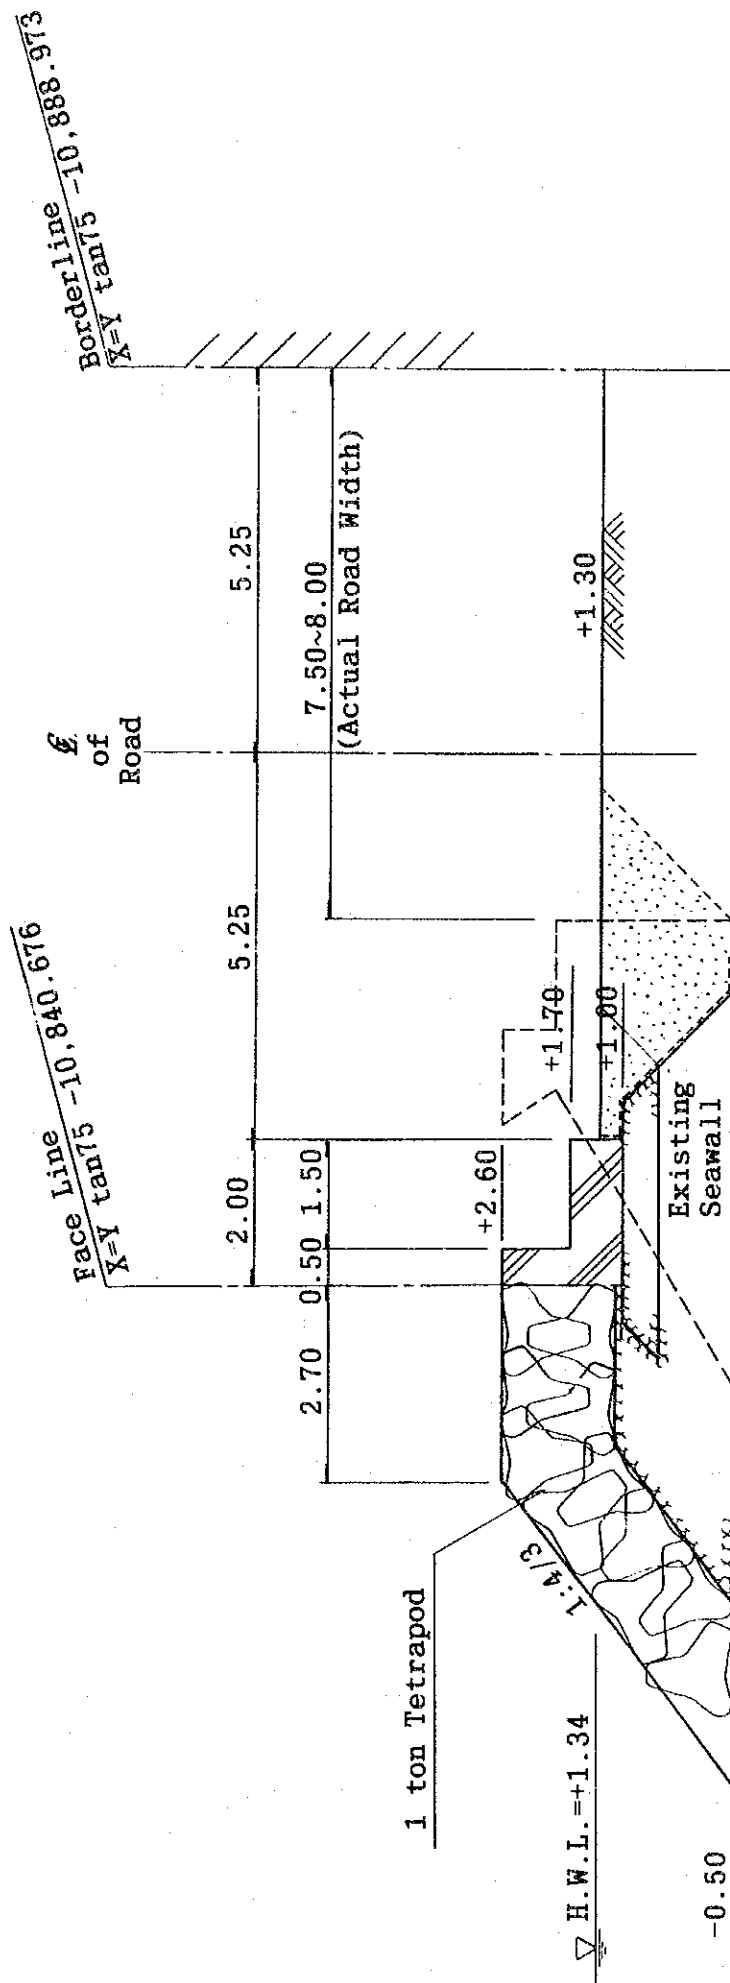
Typical Section of West Coast : South Seawall (S=1:100)
